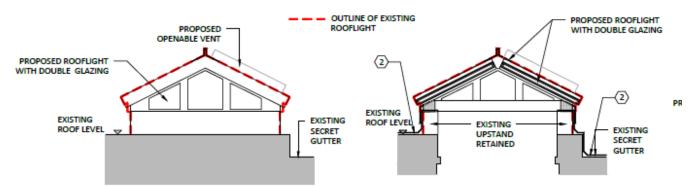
Detailed section of the roof lights in roofs 4-7 (drawing ref. 200-11)
